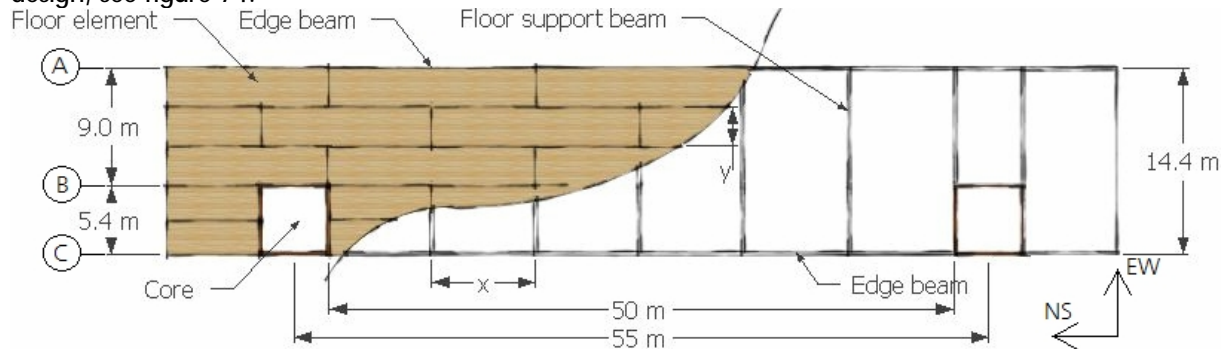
Support beams underneath the floor elements (indicative, not to scale)
